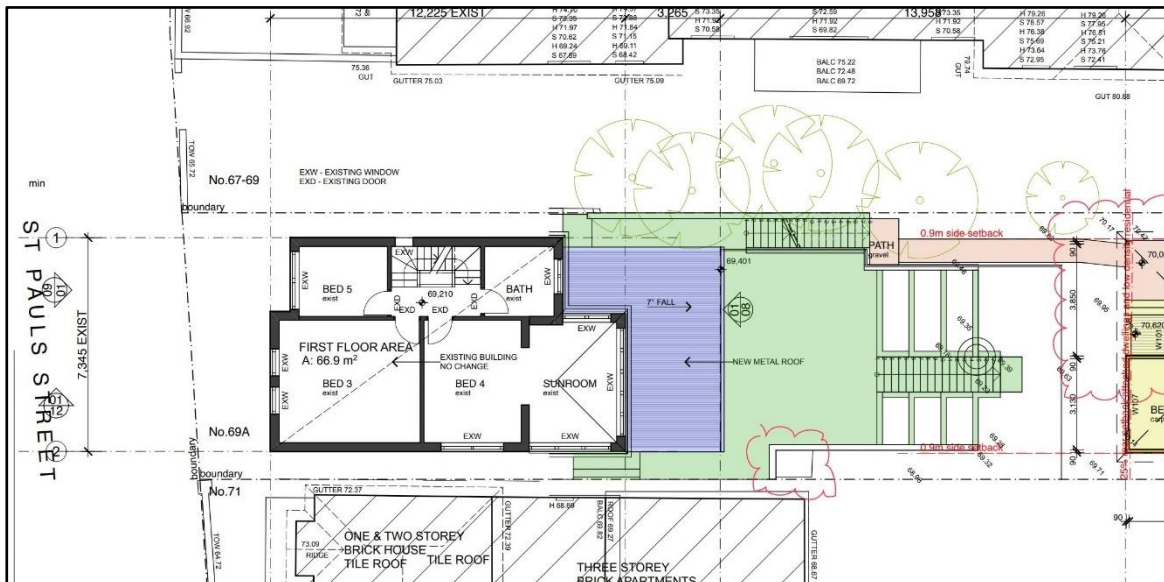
First Floor Plan (Rev B), 2/11/2023 (Fortey & Grant Architecture)
